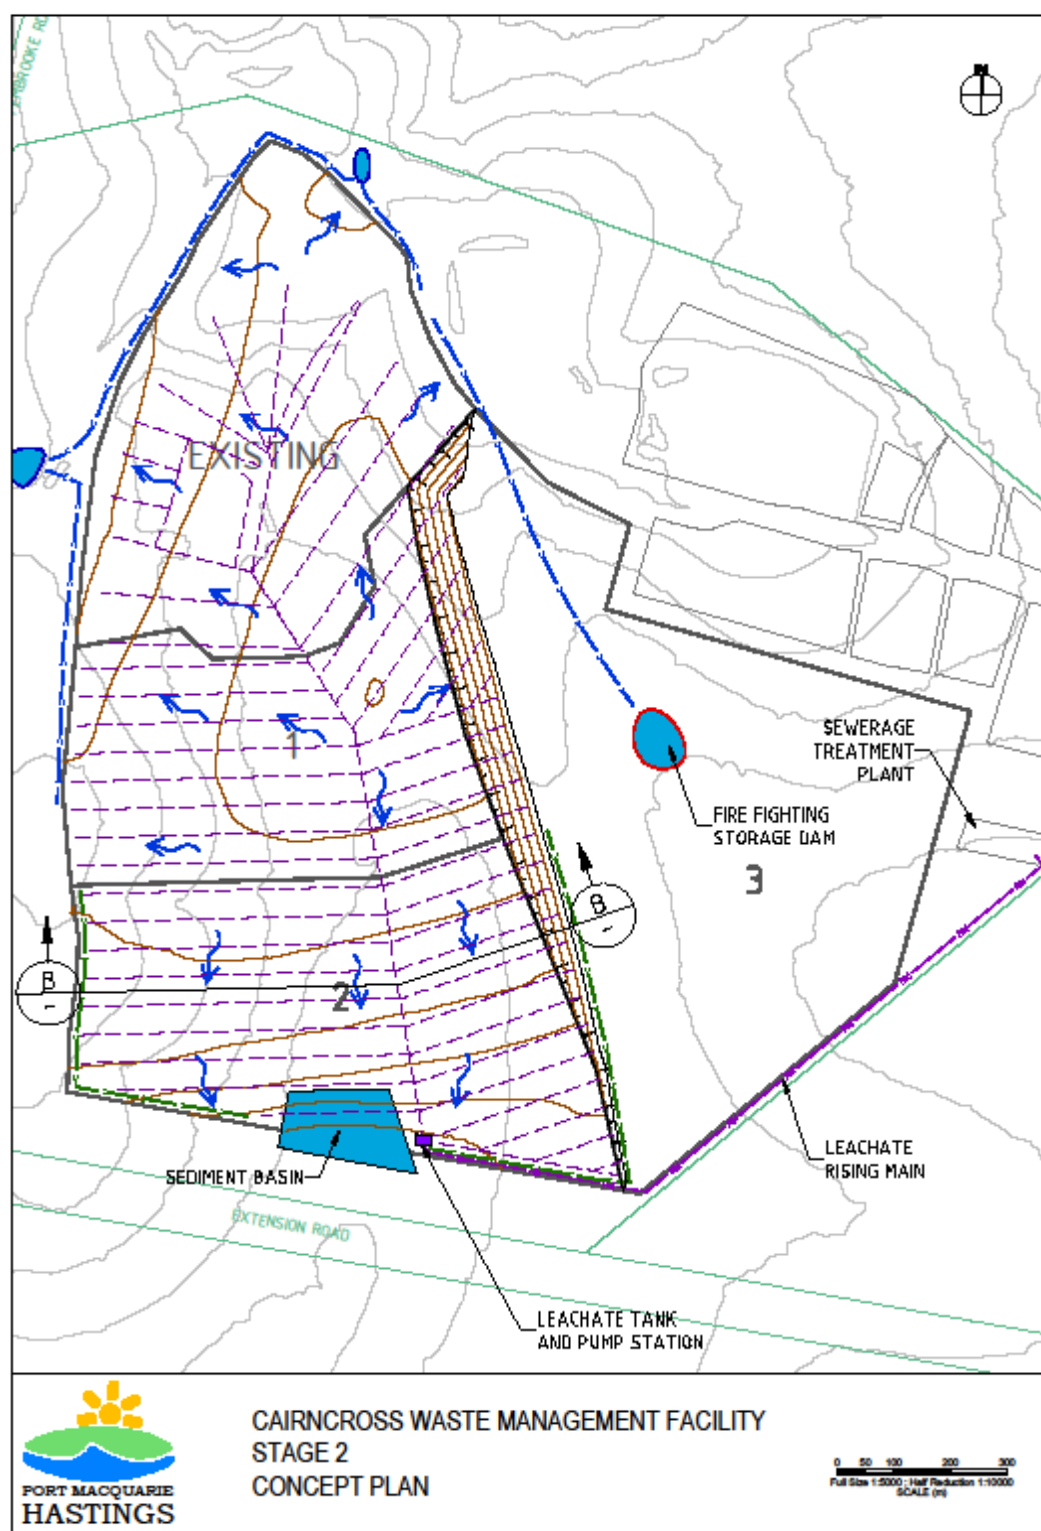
Proposed landfill layout and stages (Stage 2)
